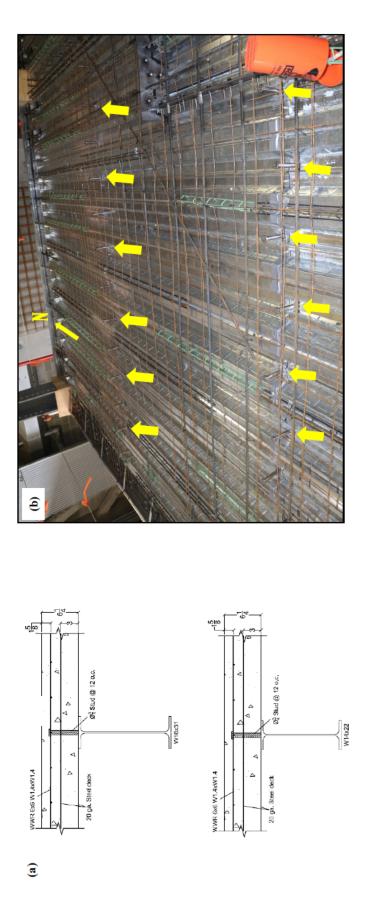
(a) Images showing the composite beam-concrete sections with headed shear studs and (b) construction photo of the northwest corner of the test frame showing the headed shear studs welded to the W14x22 beams.
